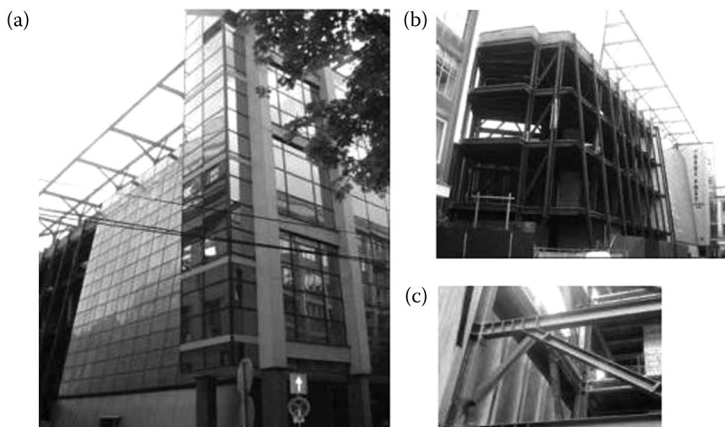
Banc Post Building in Timisoara, Romania: (a) facade; (b) steel structure under erection; (c) K-braced EBF.
